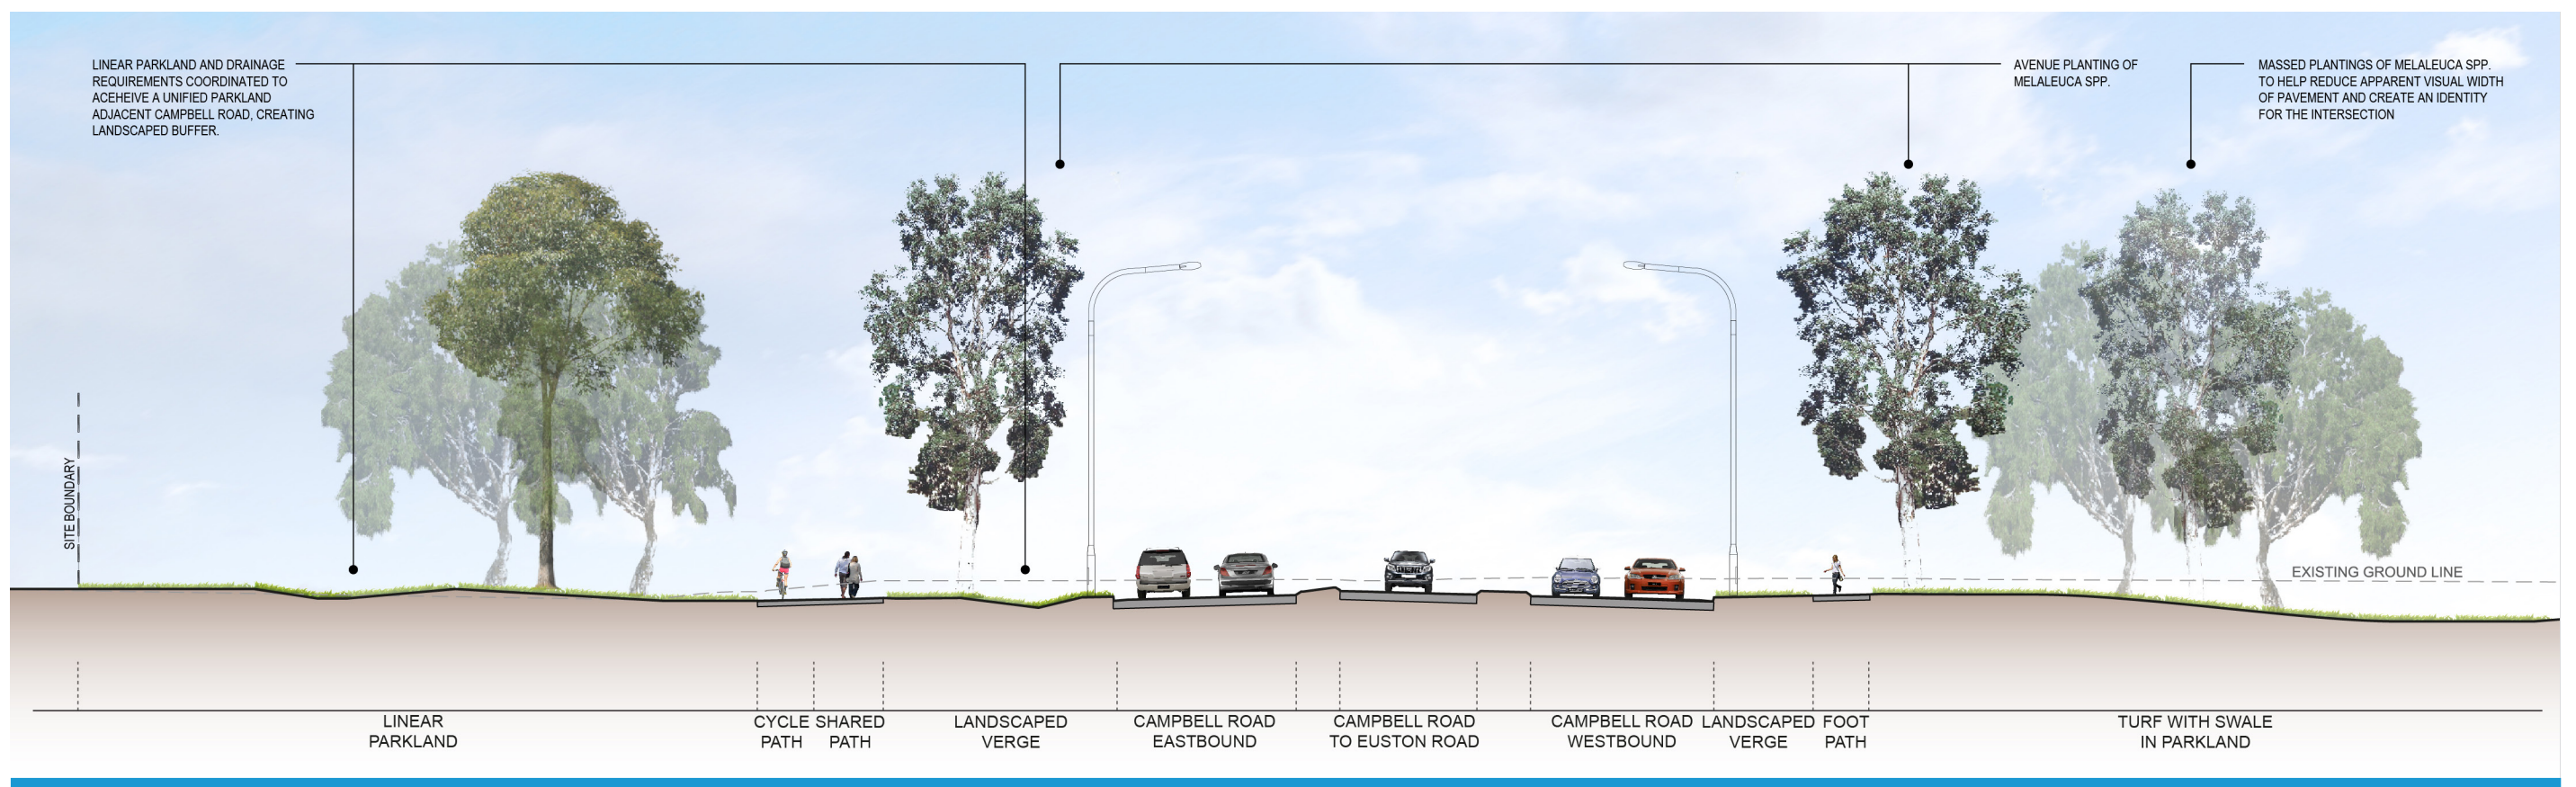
Typical Cross Section - Between Euston and Burrows Road - 1:250
